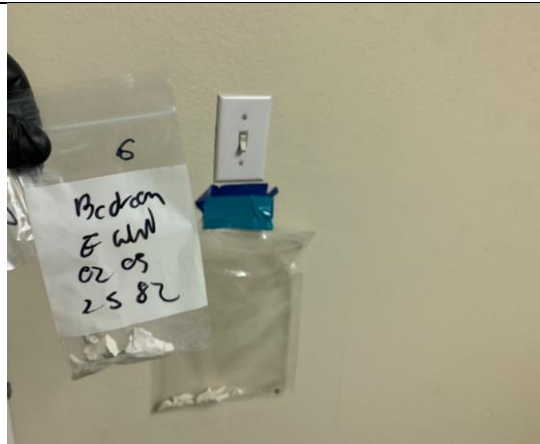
Photo of HA number 25, Sample No. 0206-25-82 | Non-ACM White Drywall and Joint Compound, Within Front Office, Captains Office, Hallway, Day Room, Bathroom 2, Bedroom 1 and Open Room
